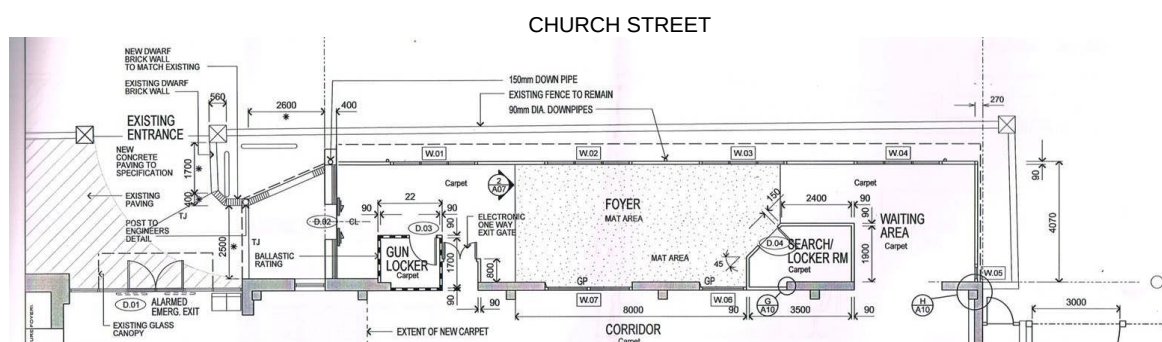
Plan of the 2005 Secure Court Entry Foyer. (John Carr Project Architect)
